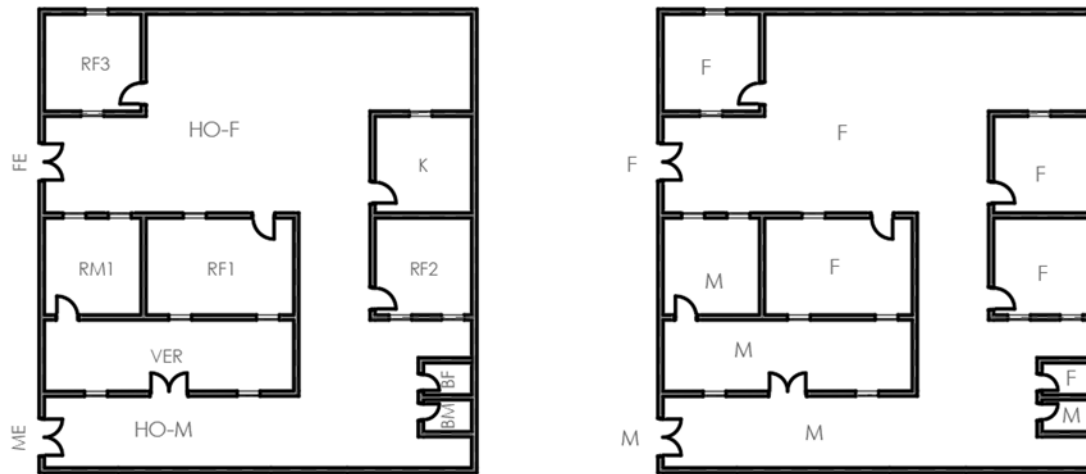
Case 8 - Layout Plan and the Male & Female Domains Layout
